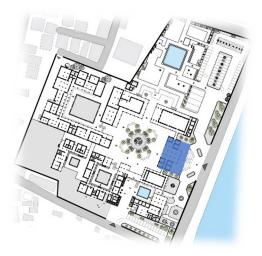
KEY PLAN WITH HIGHLIGHTED ENTRY AND SOUVENIR
